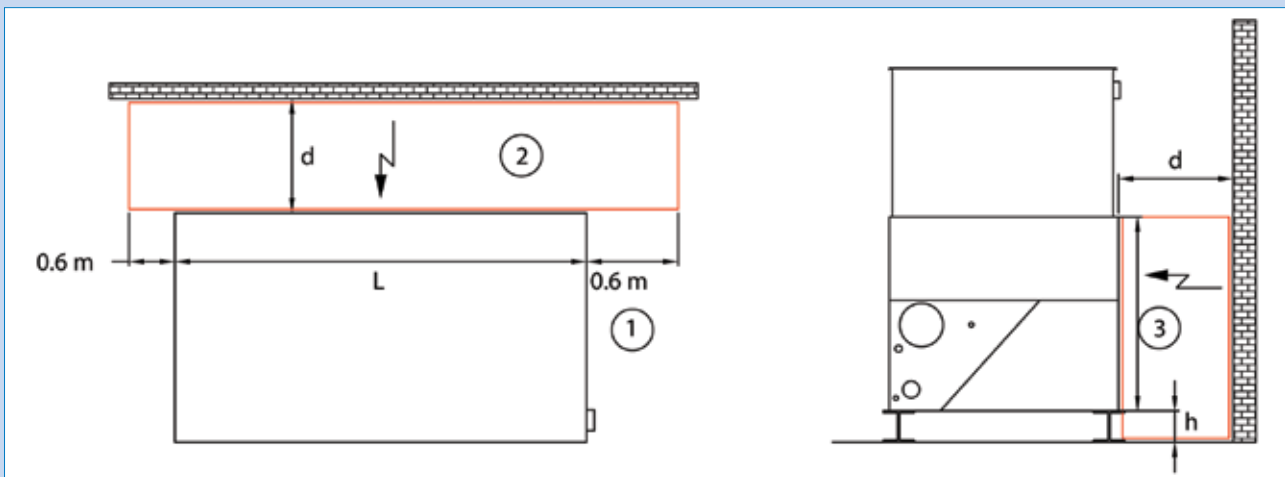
Unit with Single Air Inlet adjacent to a Wall
